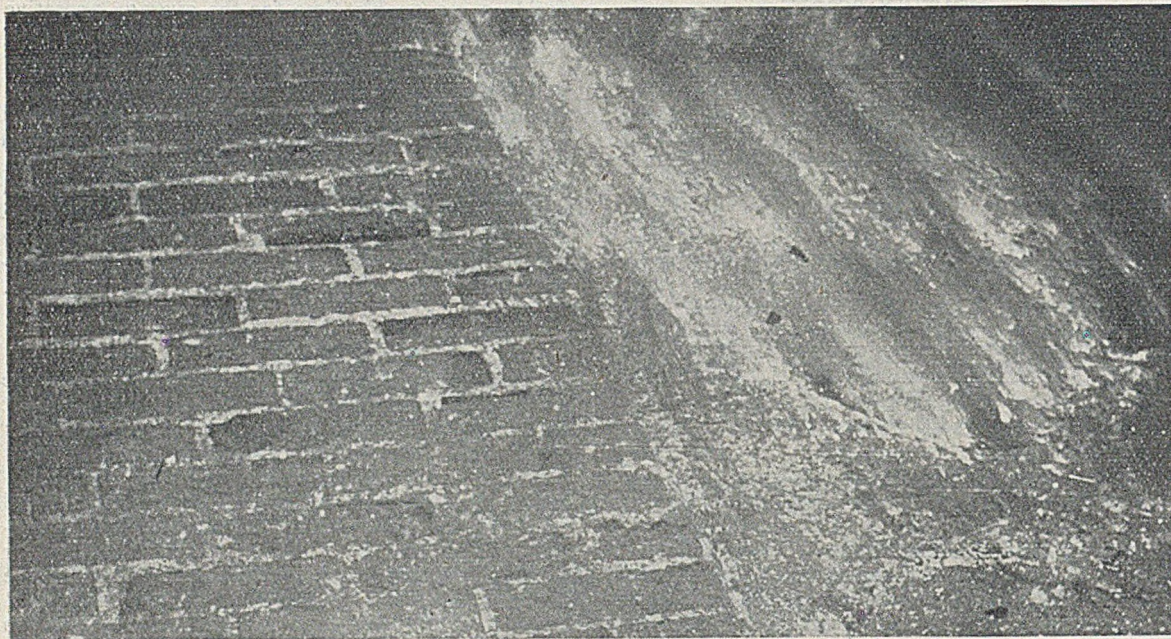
Two Areas of Fitting-shop Floor Laid at about the Same Date, One of Hardened Concrete and One of Blue Bricks. The Concrete has worn about 2 in. below the Brickwork.
